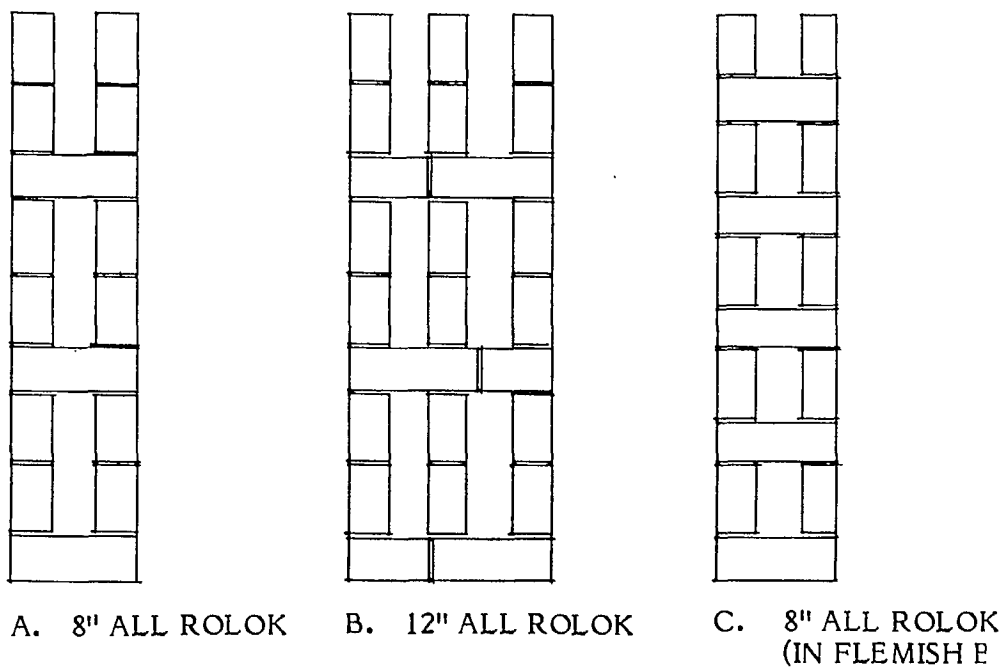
ROLOK WALL CONSTRUCTION
